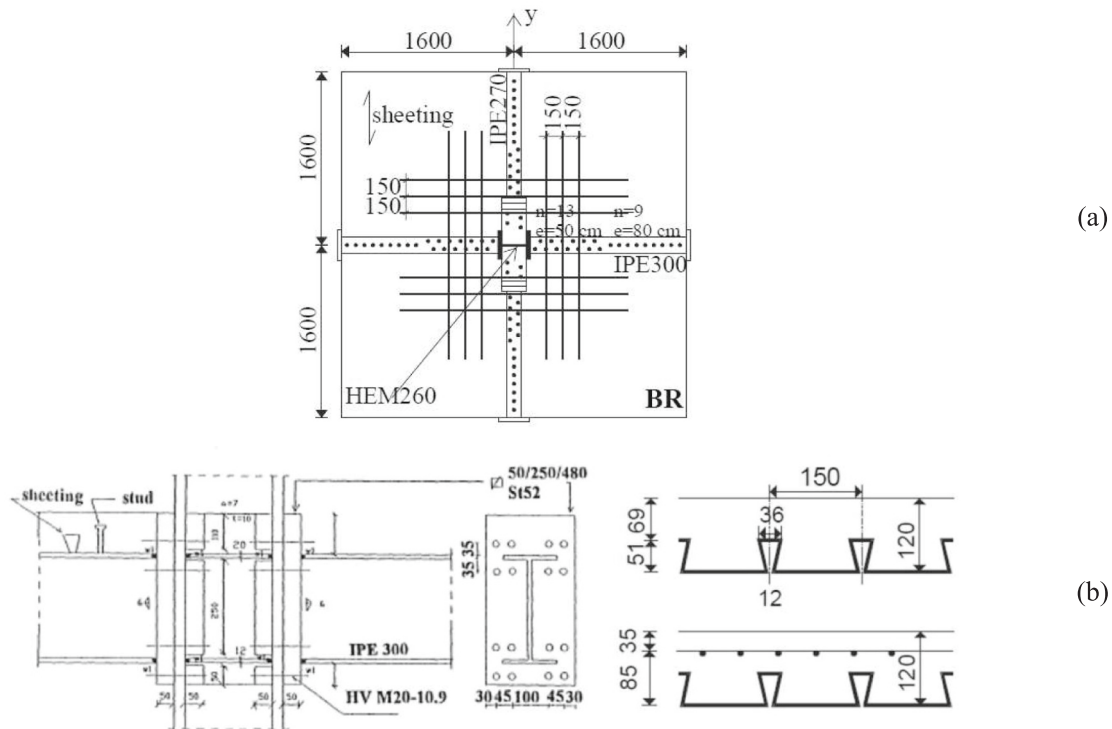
Reference interior bolted joint: (a) top view; (b) joint detail with profiled steel sheeting (dimensions in mm).
